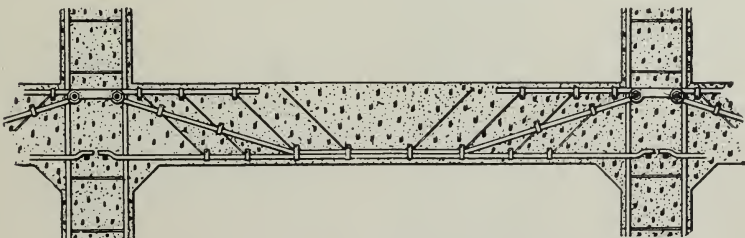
Concrete Girder and Columns with Pin-connected Frame.
